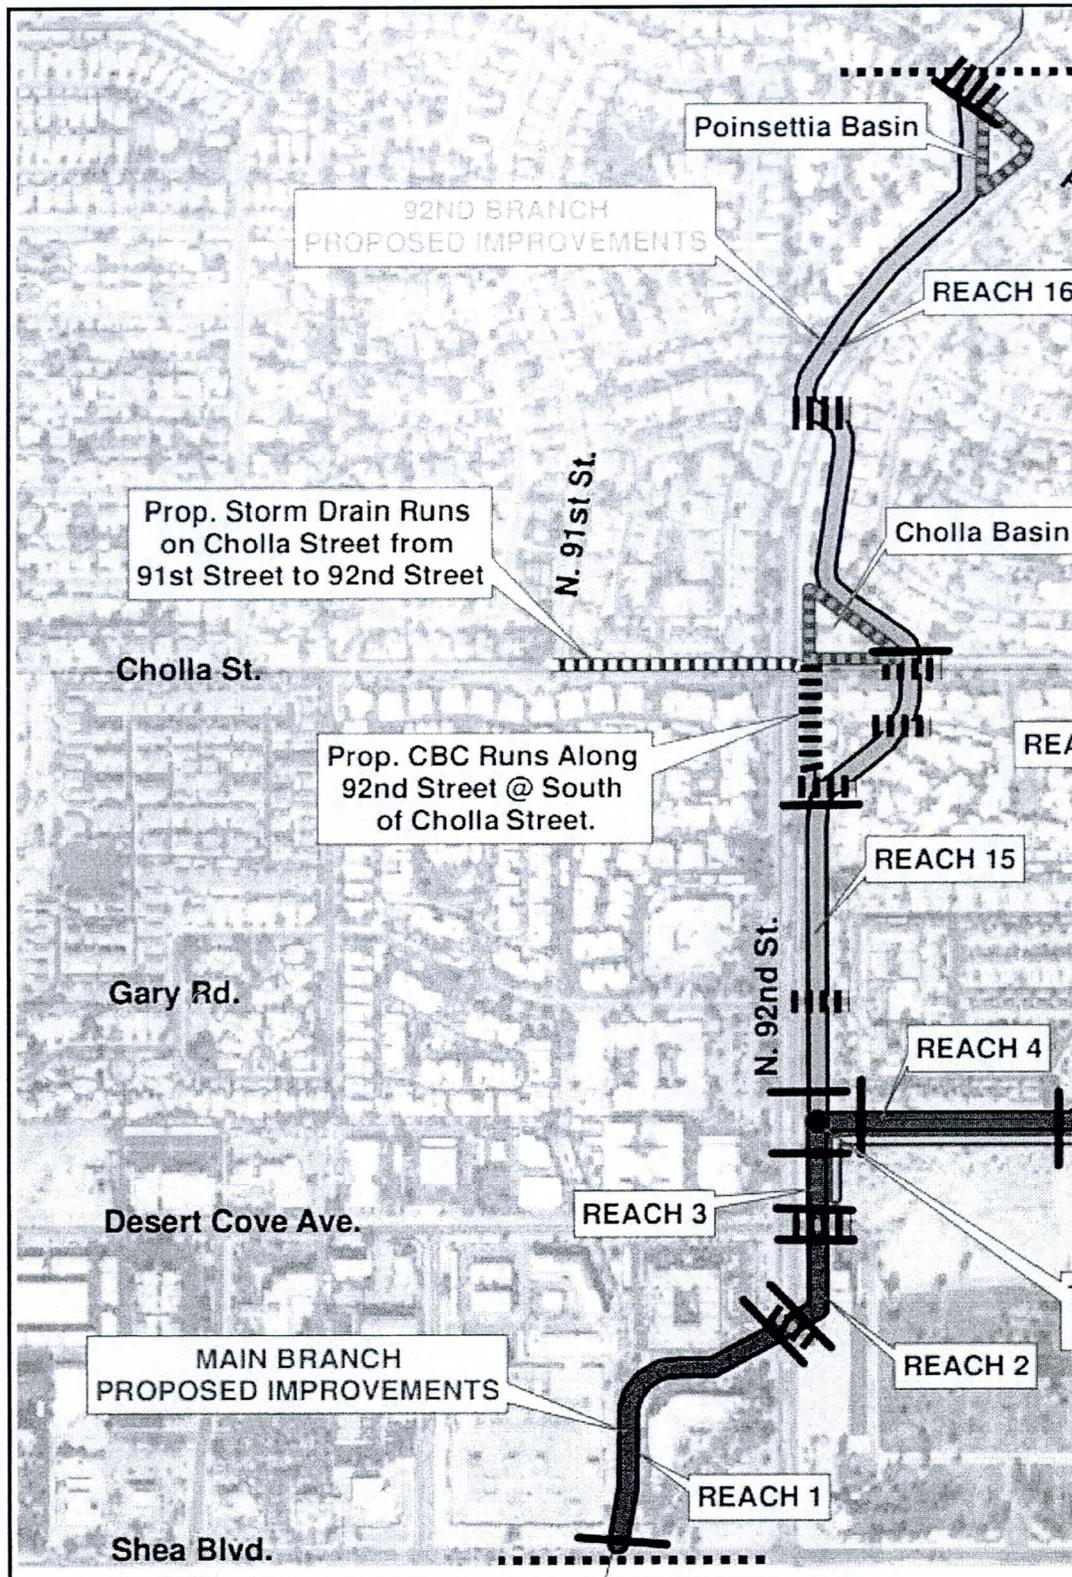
Proposed Stormdrain conduit along Cholla St between 91st and 92nd streets
